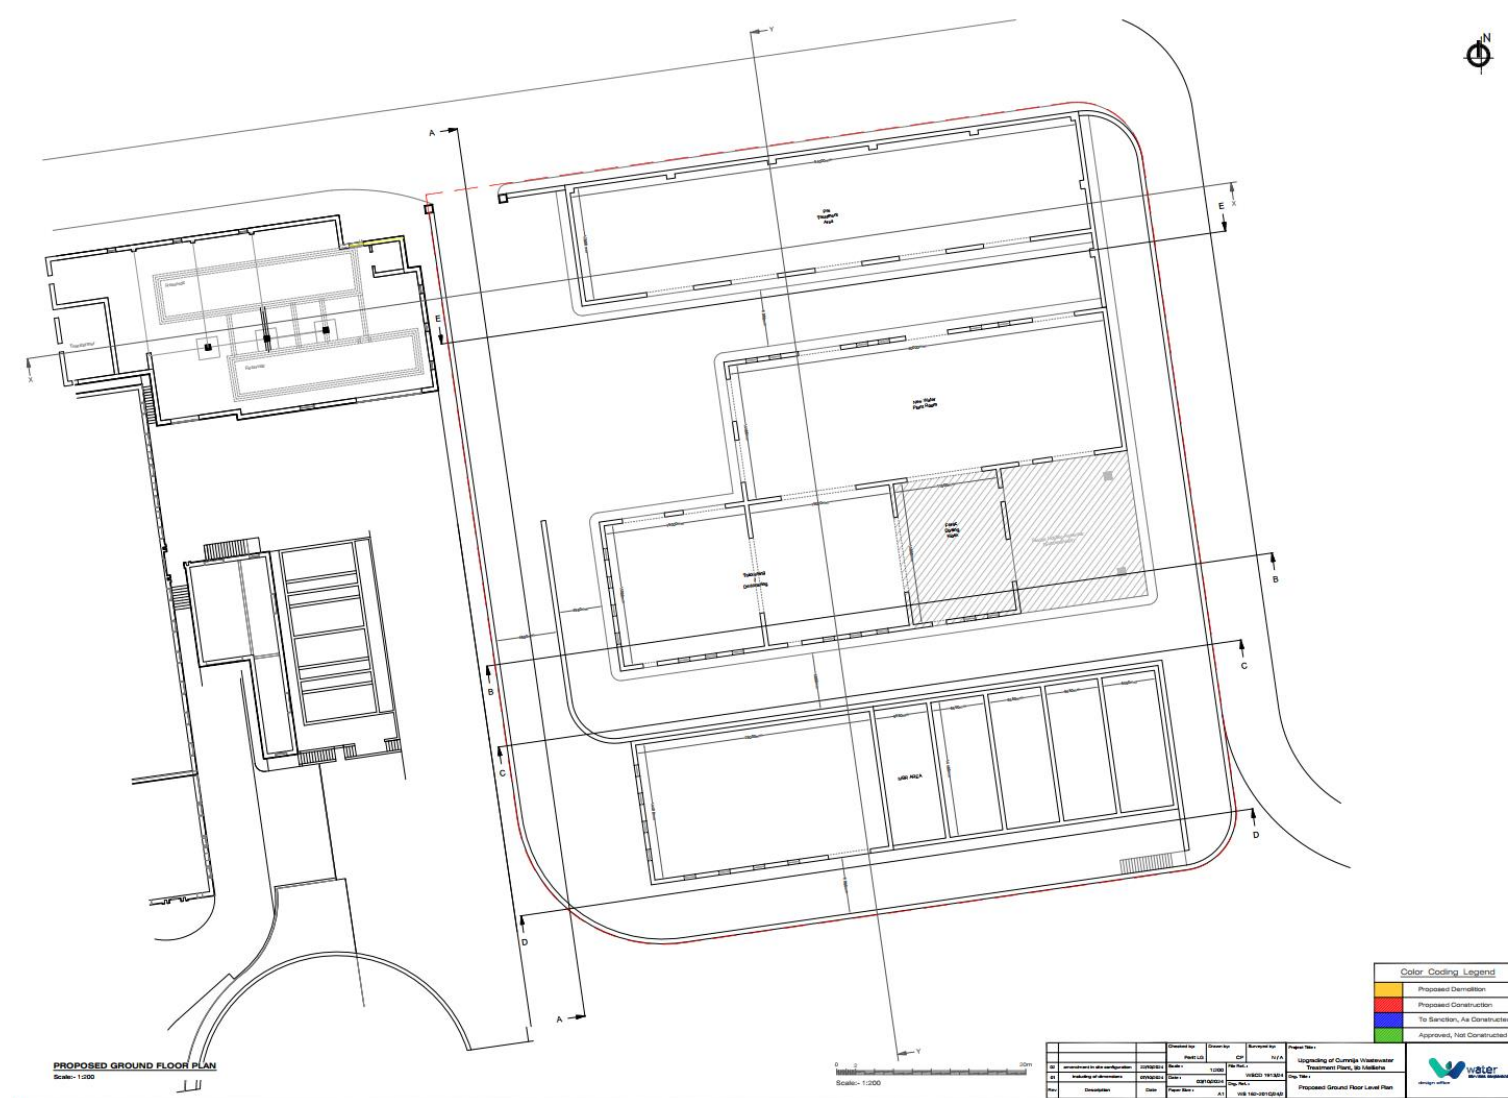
Proposed plan - detailed (*Source*: TRK289962)
